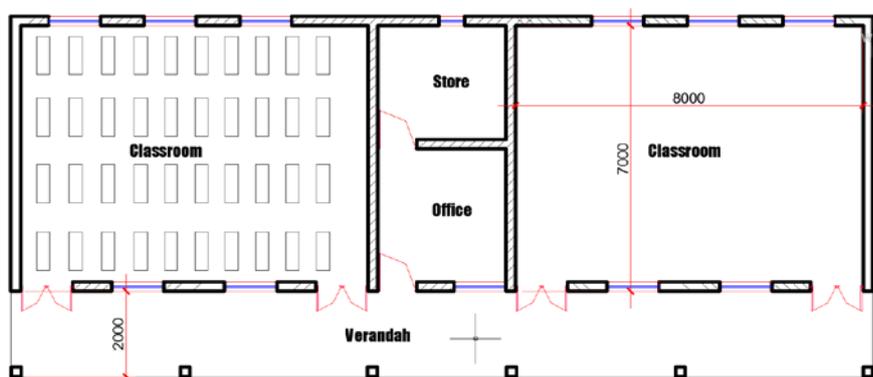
Typical plan of a block of classroom in public schools. Source. Fieldwork (2017)
